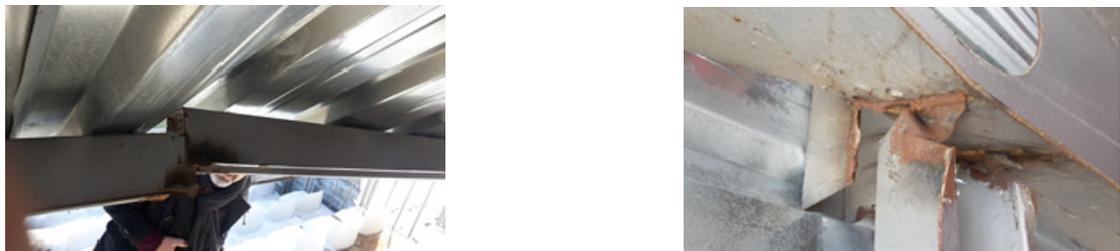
Some views of completely collapsed cantilever roof of tribune structure
